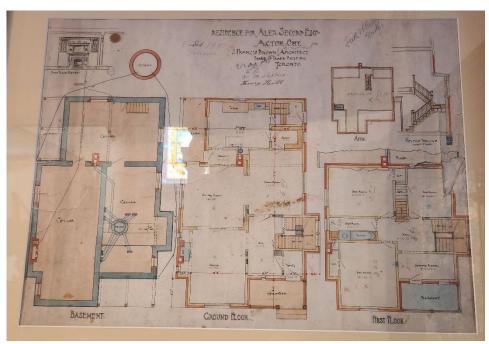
Photograph of the original floor plans for Villanore by J. Francis Brown
